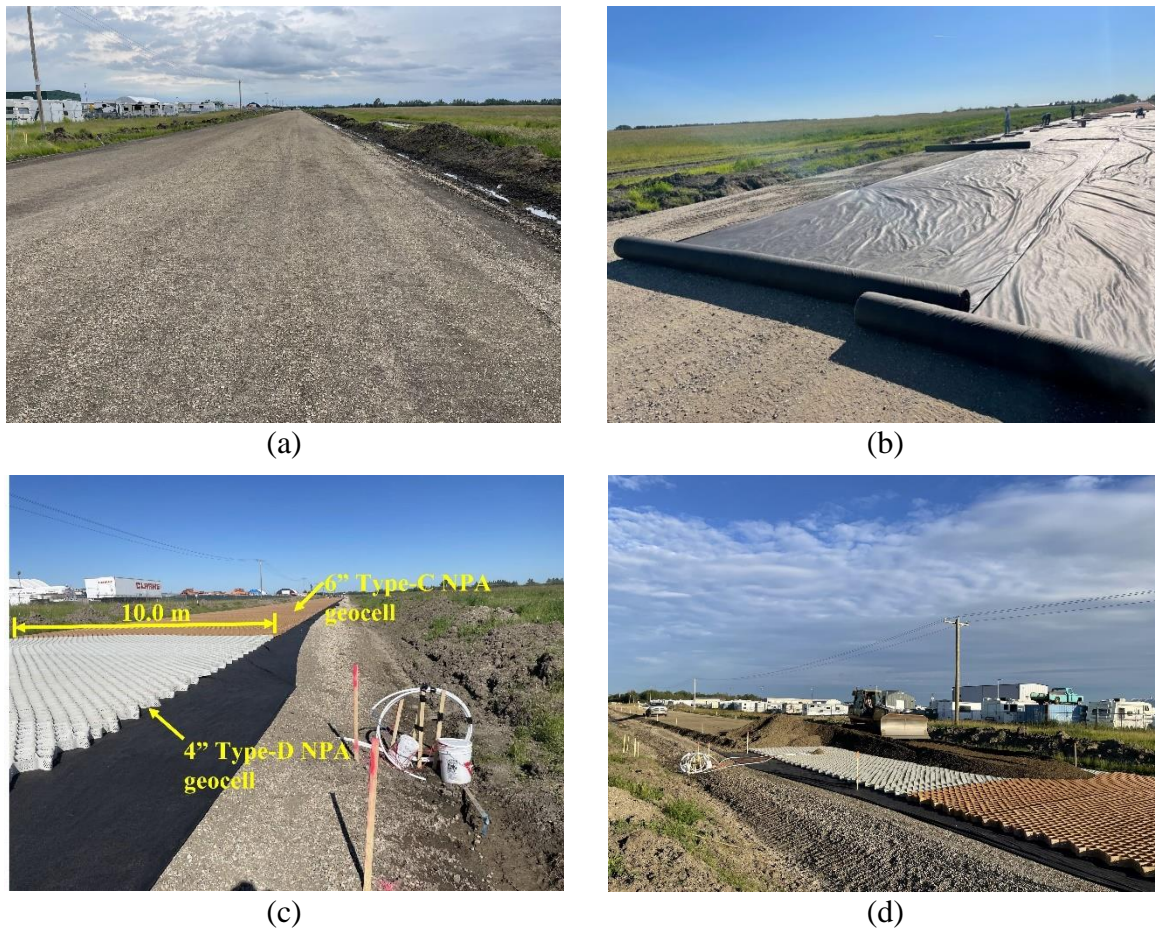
The construction process of geocell-stabilized sections in: (a) compacted subbase, (b) placing nonwoven geotextile, (c) installing geocell, and (d) adding base courses
